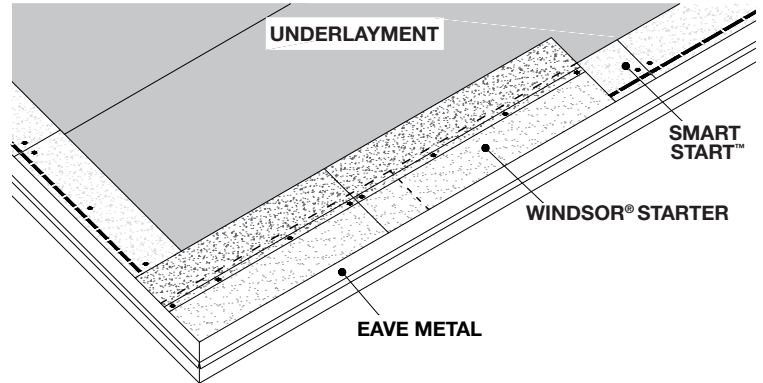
Application of Windsor® Starter Shingles over Smart Start® at the Eave Edge of Roof
